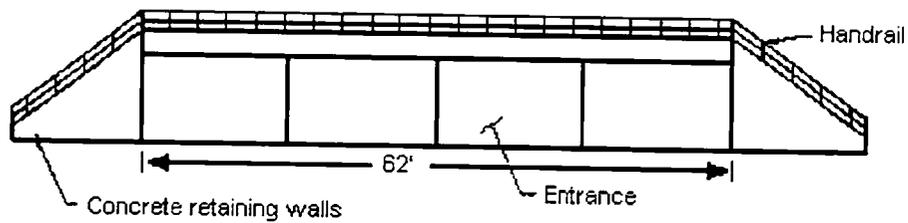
RH-TRU Retrievable Concrete Cask Storage Facility, Building 7855.
